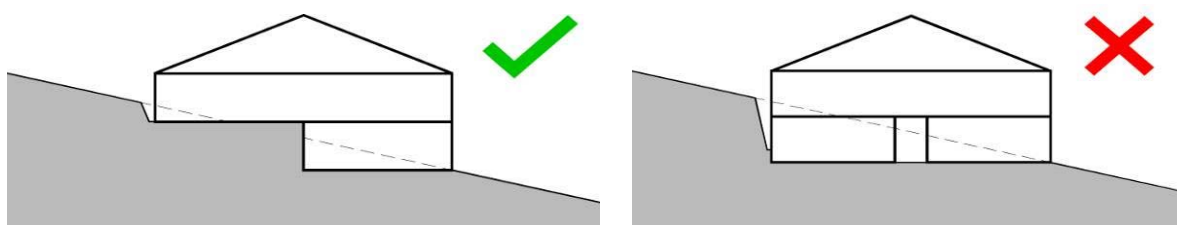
Habitable rooms are to have at least one external wall entirely above existing ground level
